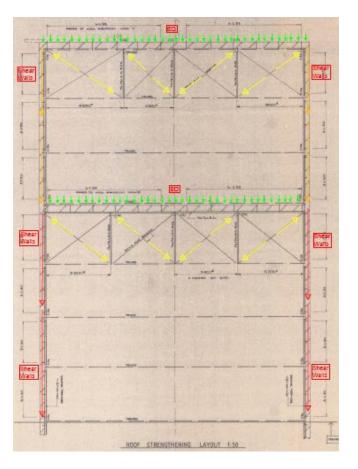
Southland Times rear element roof bracing longitudinal lateral load path
